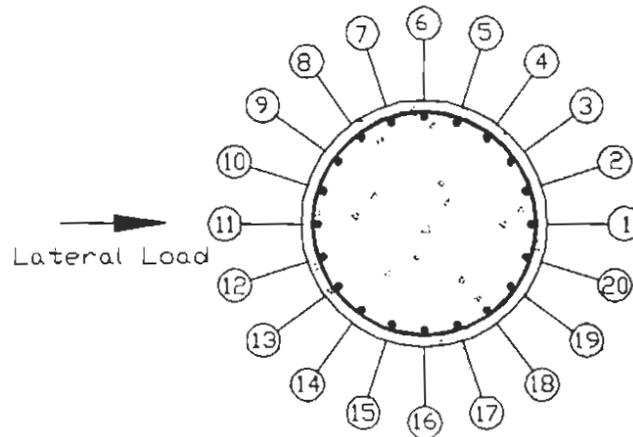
Locations of Column Rebar for Lap Splice Enhancement Circular Columns
